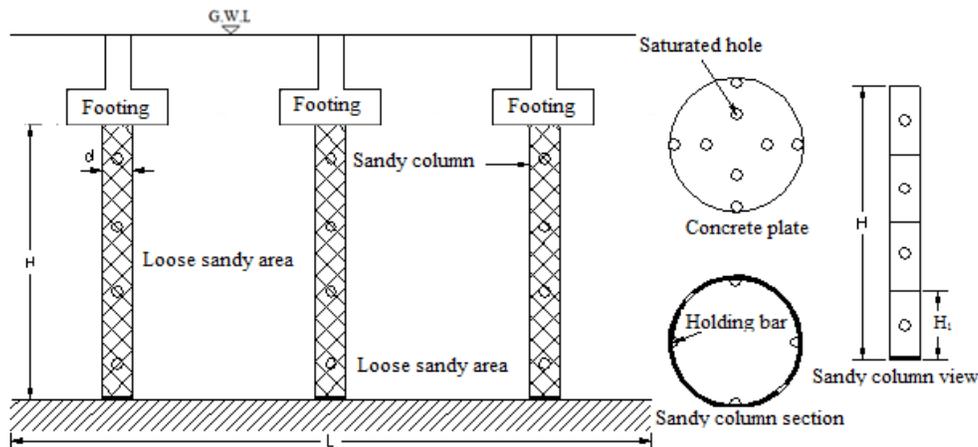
Sandy saturated semi-confined columns used under footing for improving light structure stability
